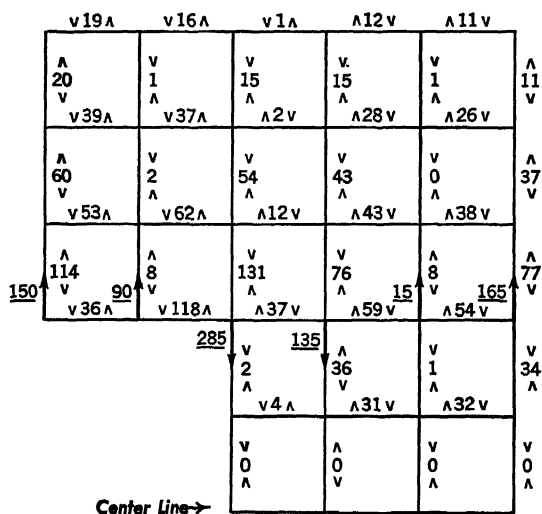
COLUMN FORCES AND GIRDER SHEARS.
